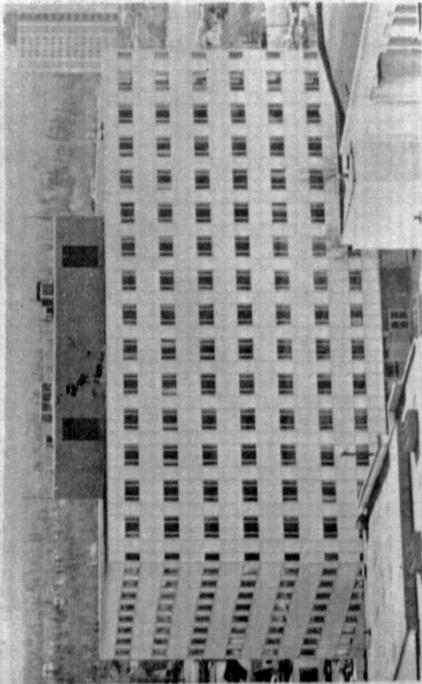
Hill Building. Insulated metal panel "skin" not damaged. Damage occurred to the rigid reinforced concrete central core walls which are located directly below the damaged penthouse.
